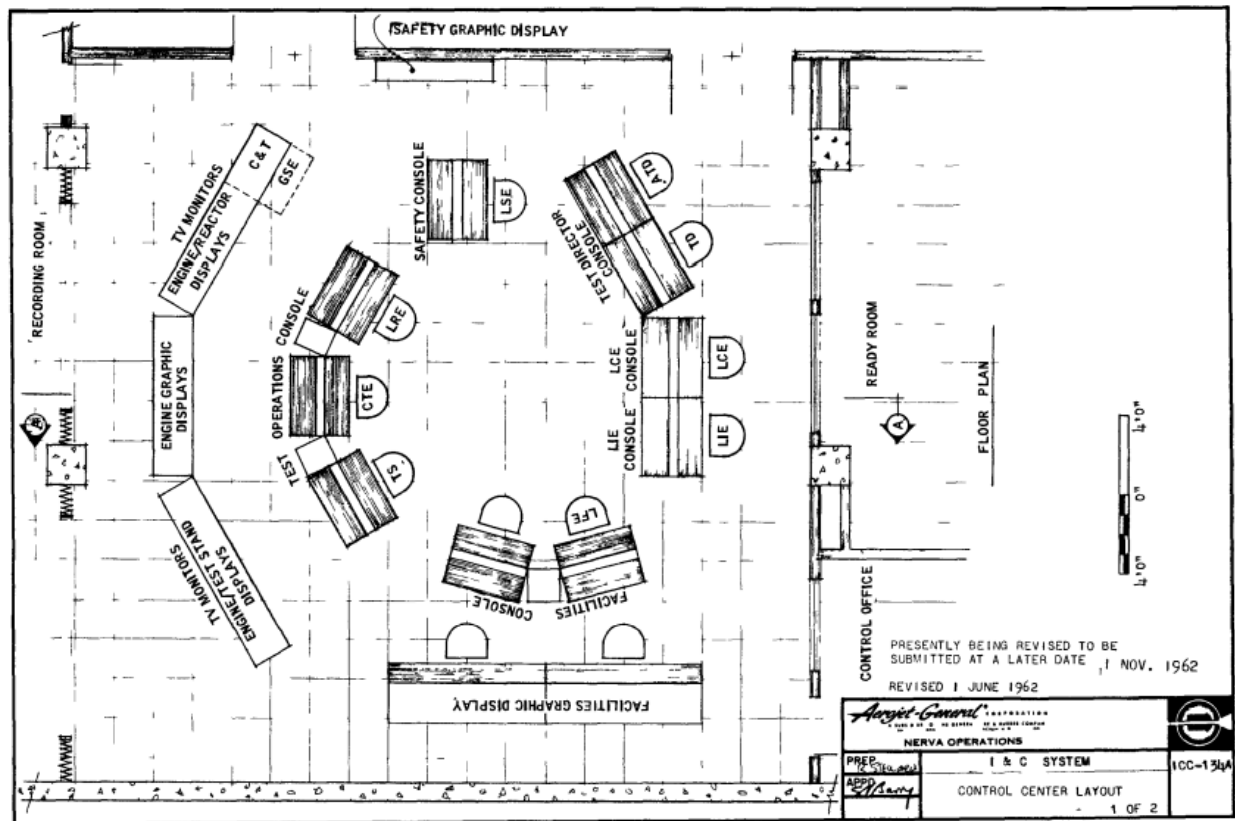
Planned layout of the underground Local Control Room at ETS-1 (Aerojet 1962:28).
